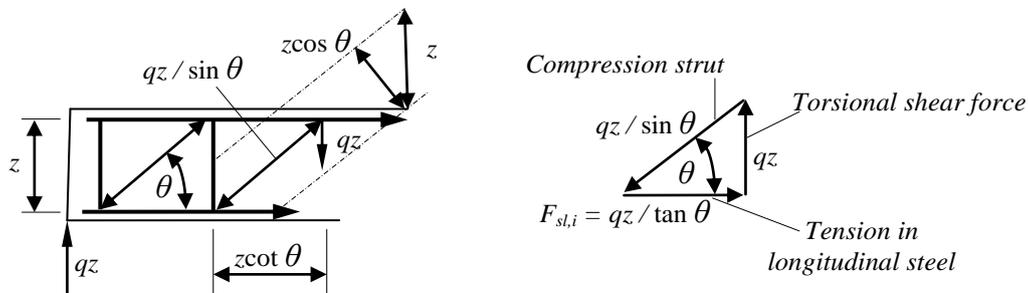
Forces acting on one face of the section. The figure is based on Mosley *et al.* (2007).
